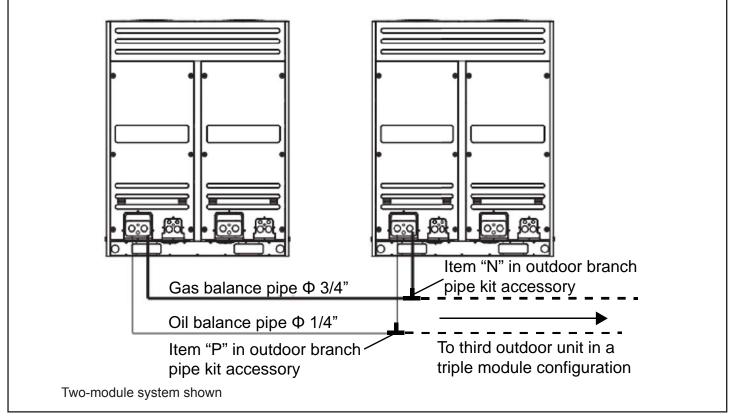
Balancing Pipe Sizes for Manifolded Outdoor Units
